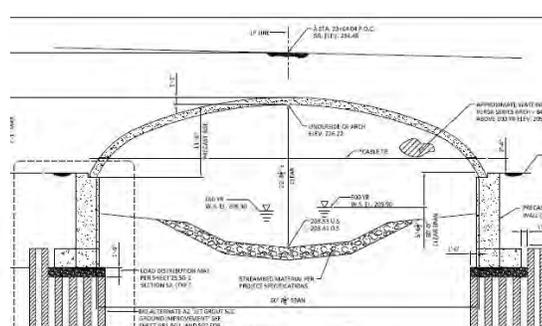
Structure Alt. 2 – Pretek Eco-Span Arch
